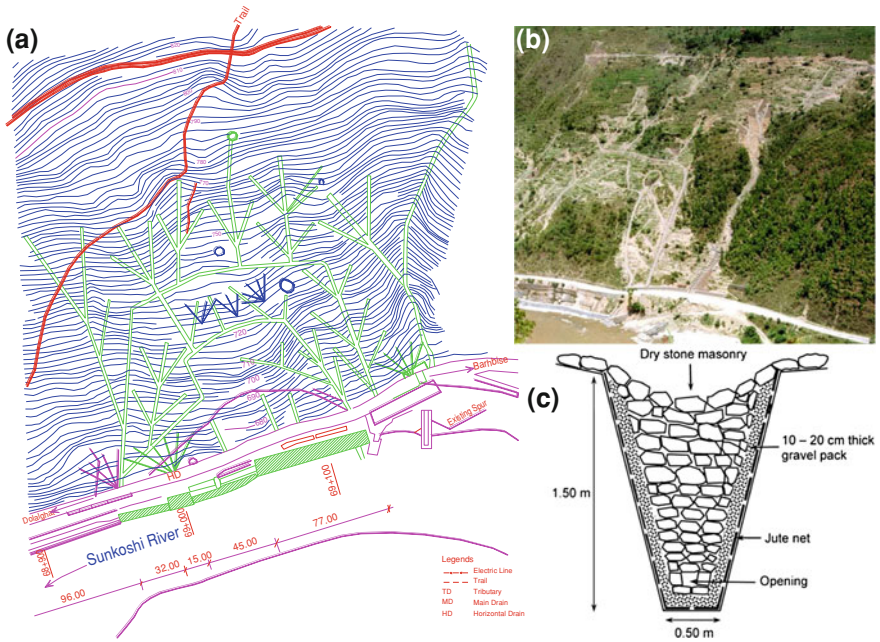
Drainage management for landslide stabilization at km 69 + 000 stretch of the Arniko Highway, connecting capital Kathmandu with Chinese boarder in North, a Engineering drawing of the site prepared by Department of Roads, b Photographic view of the site, c Section view of catch drain (Figure courtesy: Tuk Lal Adhikari)
